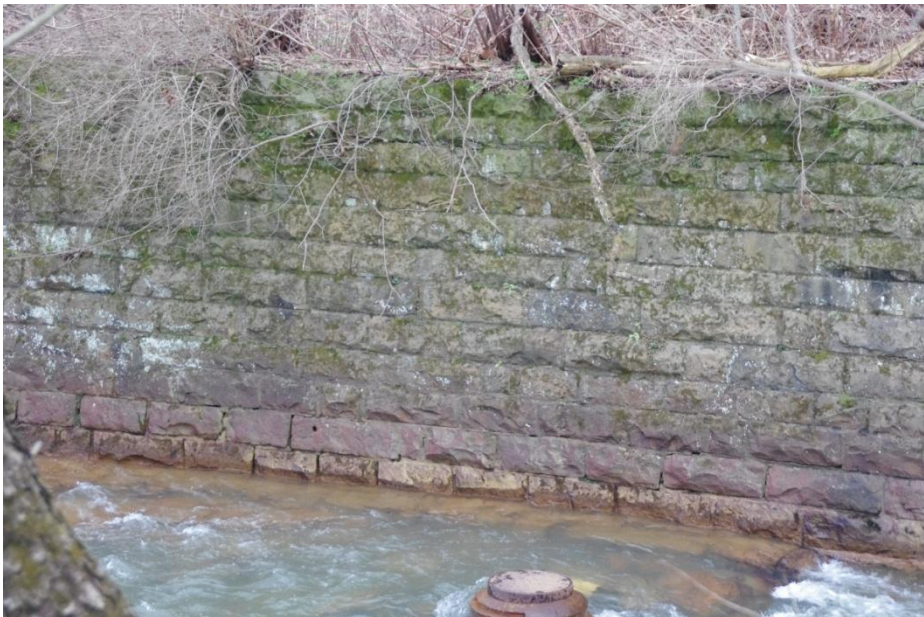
Close Up Of Deckers Creek Wall Stone Foundation
